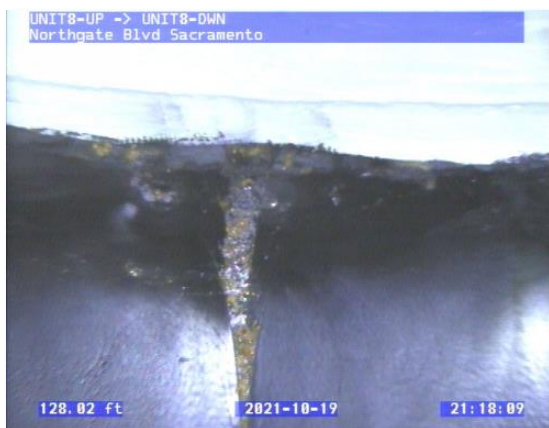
Corrosion/spall at unit #6 pipe joint.
